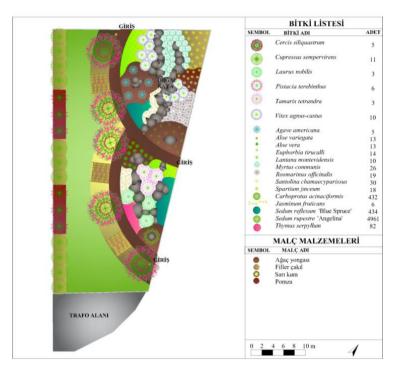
Proposed plant design project of the park in Konyaaltı district. Şekil 5. Konyaaltı ilçesindeki parkın öneri bitkisel tasarım projesi.
